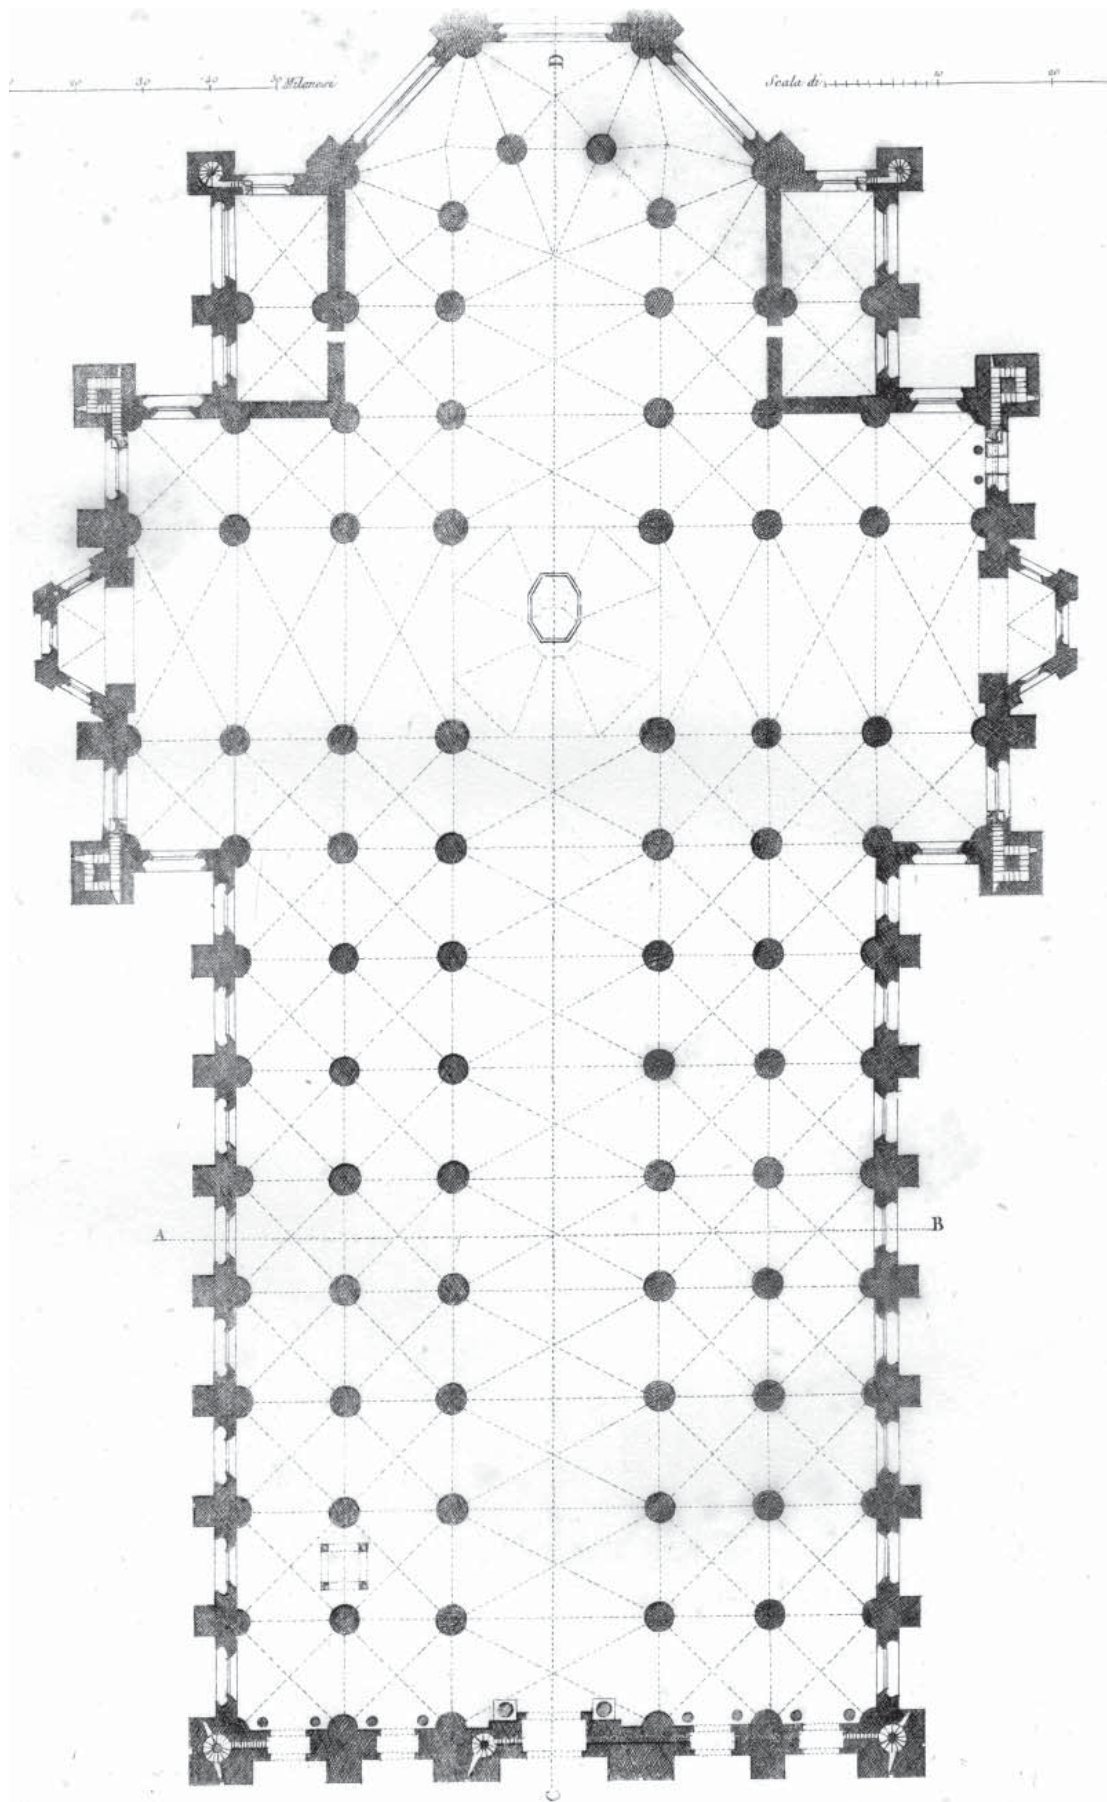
Cathedral of Milan, floor plan (Franchetti).
